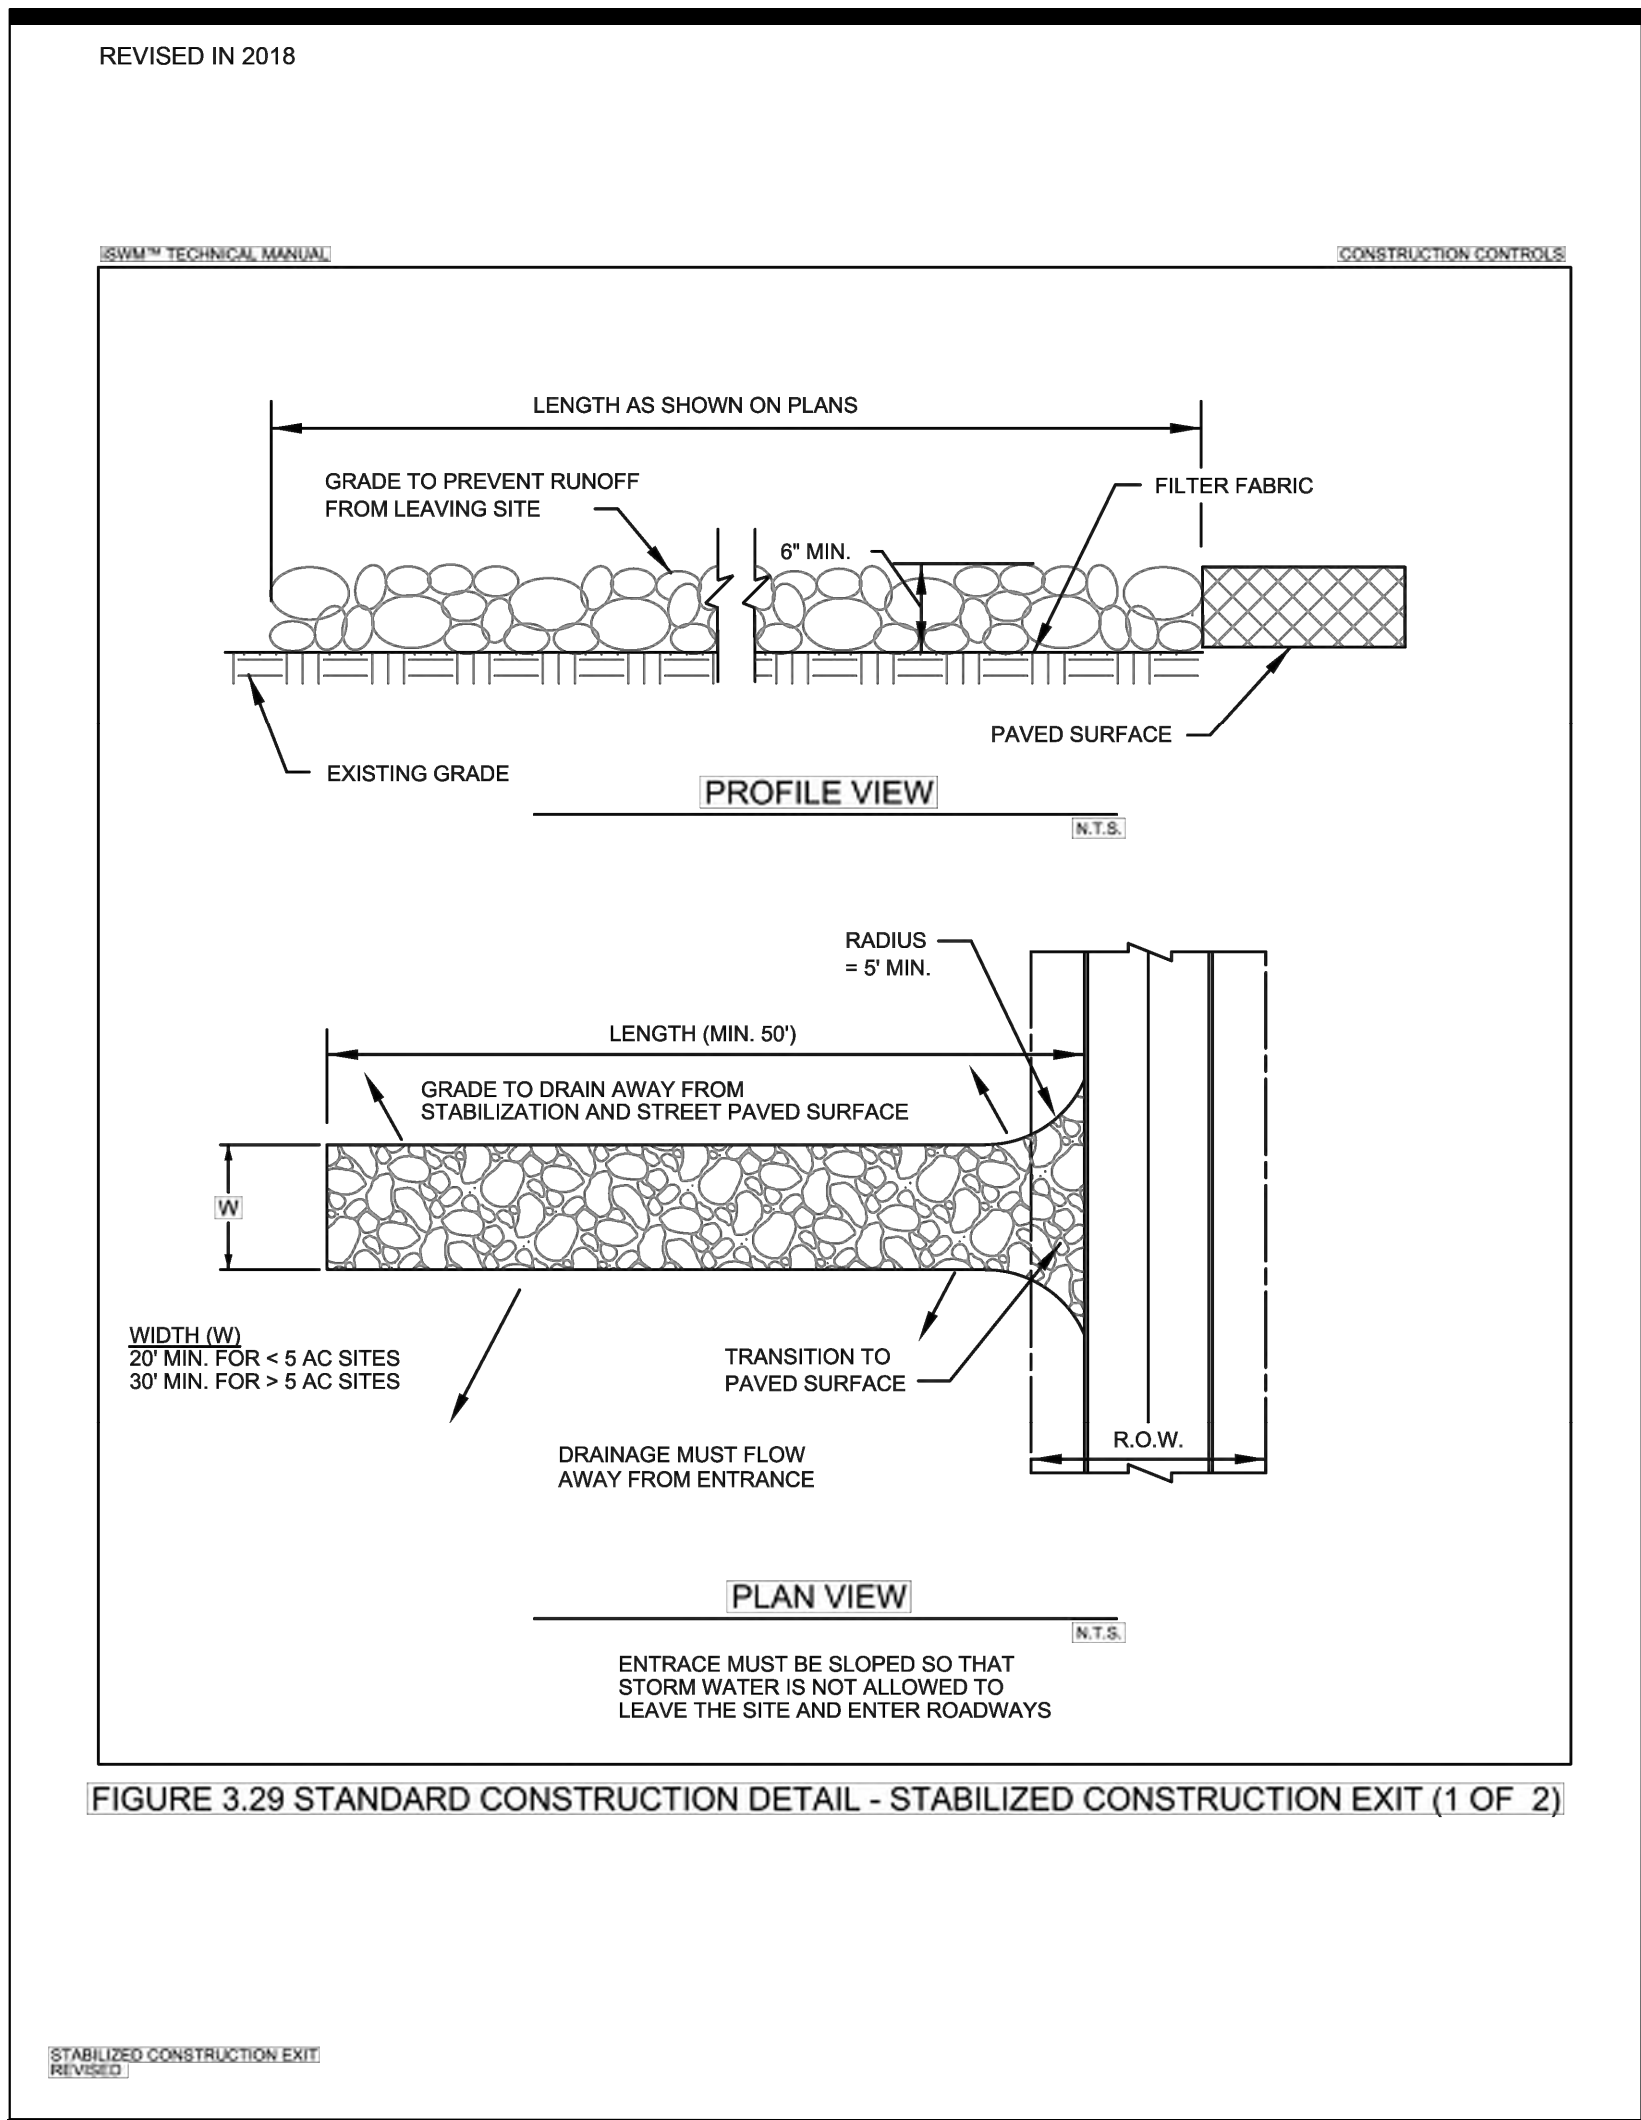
STANDARD CONSTRUCTION DETAIL - STABILIZED CONSTRUCTION EXIT (1 OF 2)
